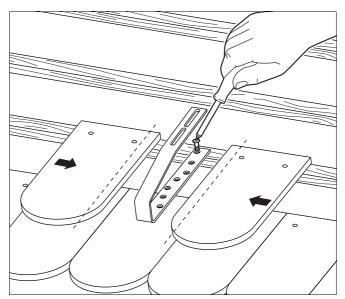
Cut crown tile and install special additional roof hooks (accessories)
